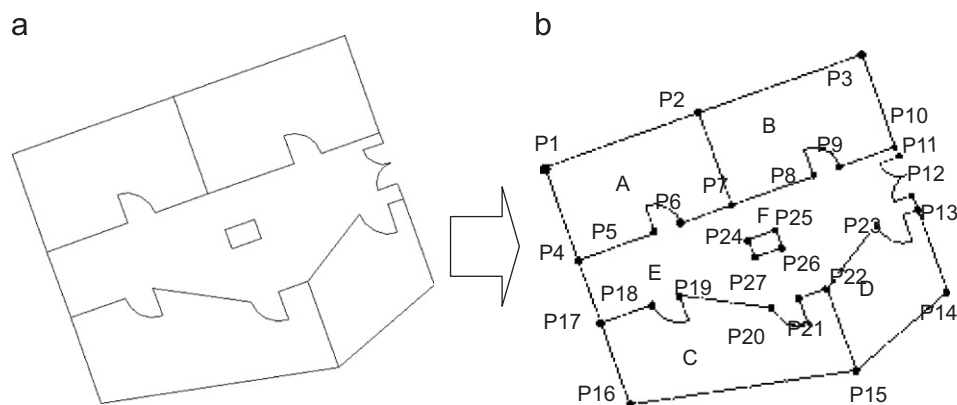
Task of recognizing a floor plan (a) given floor plan and (b) result after processing.
